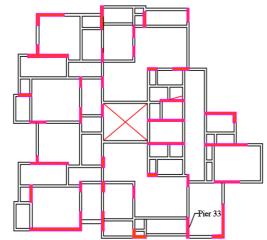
Plan showing the location of Pier 33 (Critical shear wall)
